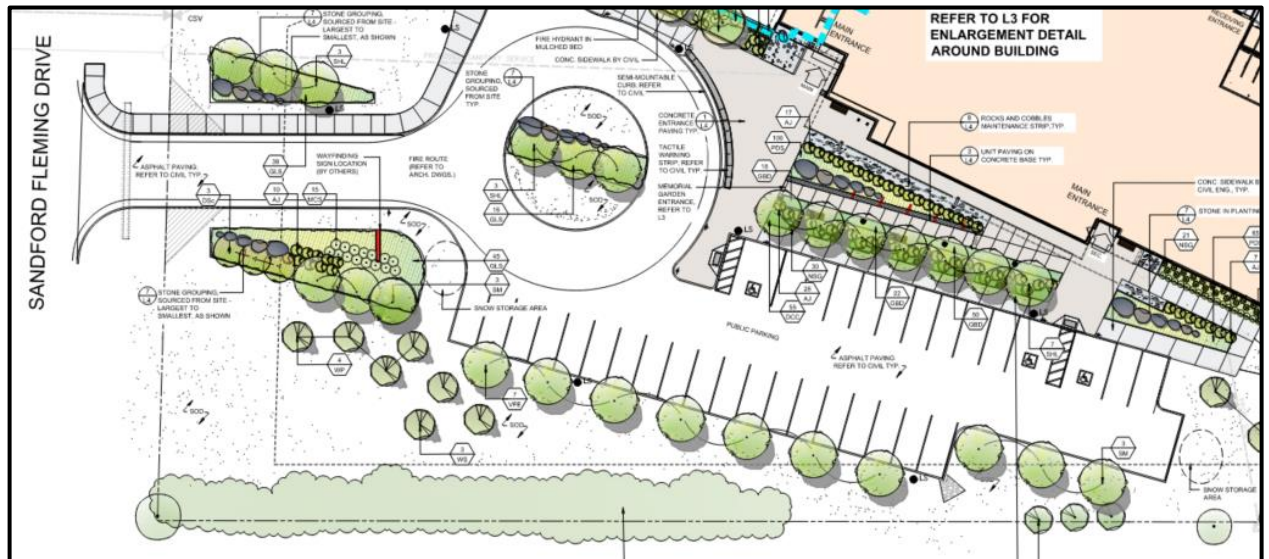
Excerpt of Landscape Plan showing the enhanced landscaping between the parking area and Sanford Fleming Drive
